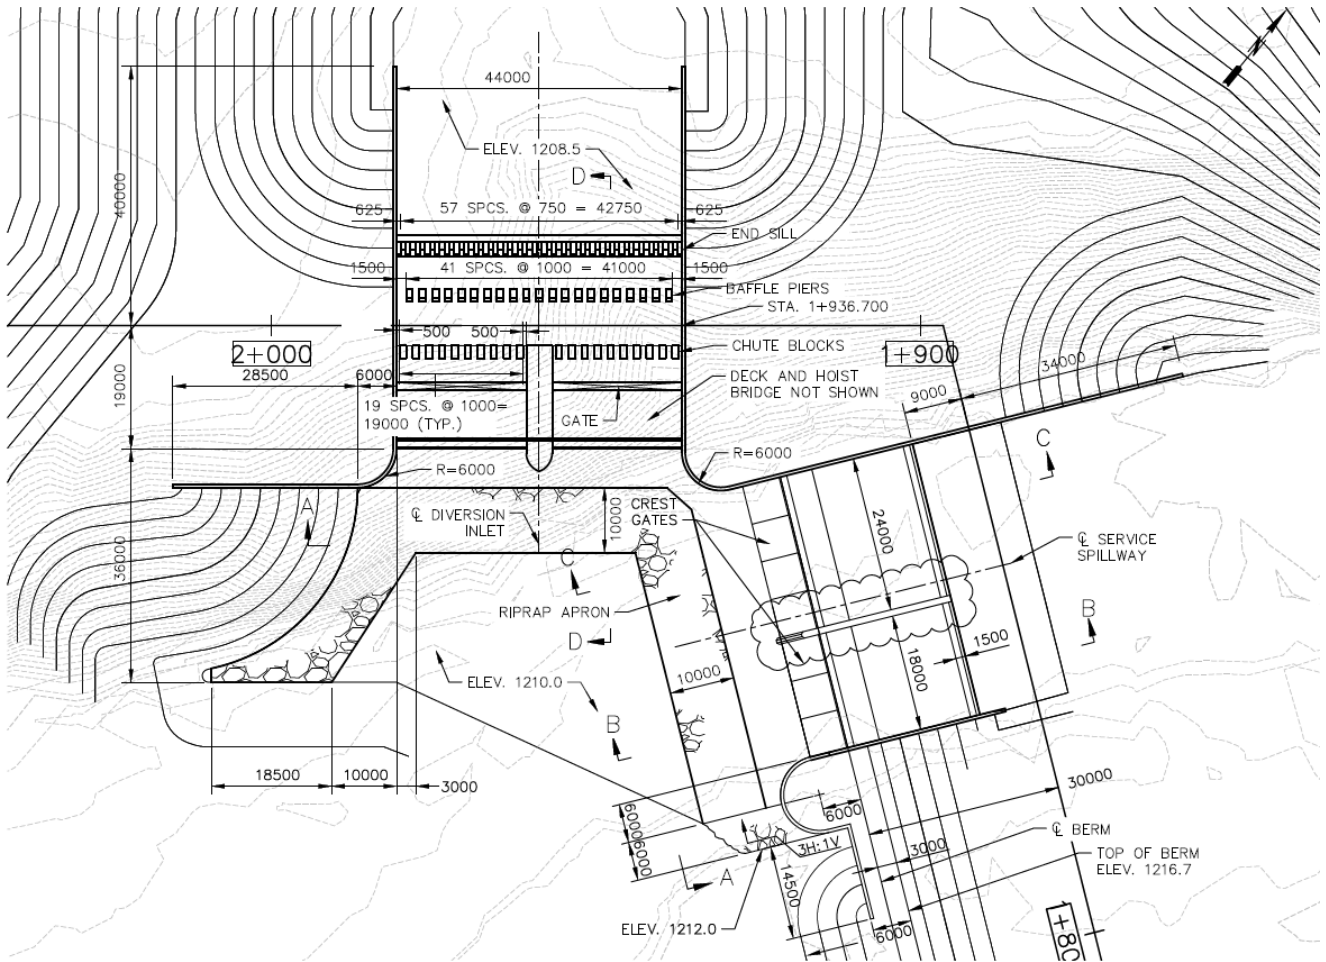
Plan view of the revised diversion inlet structure and service spillway.
